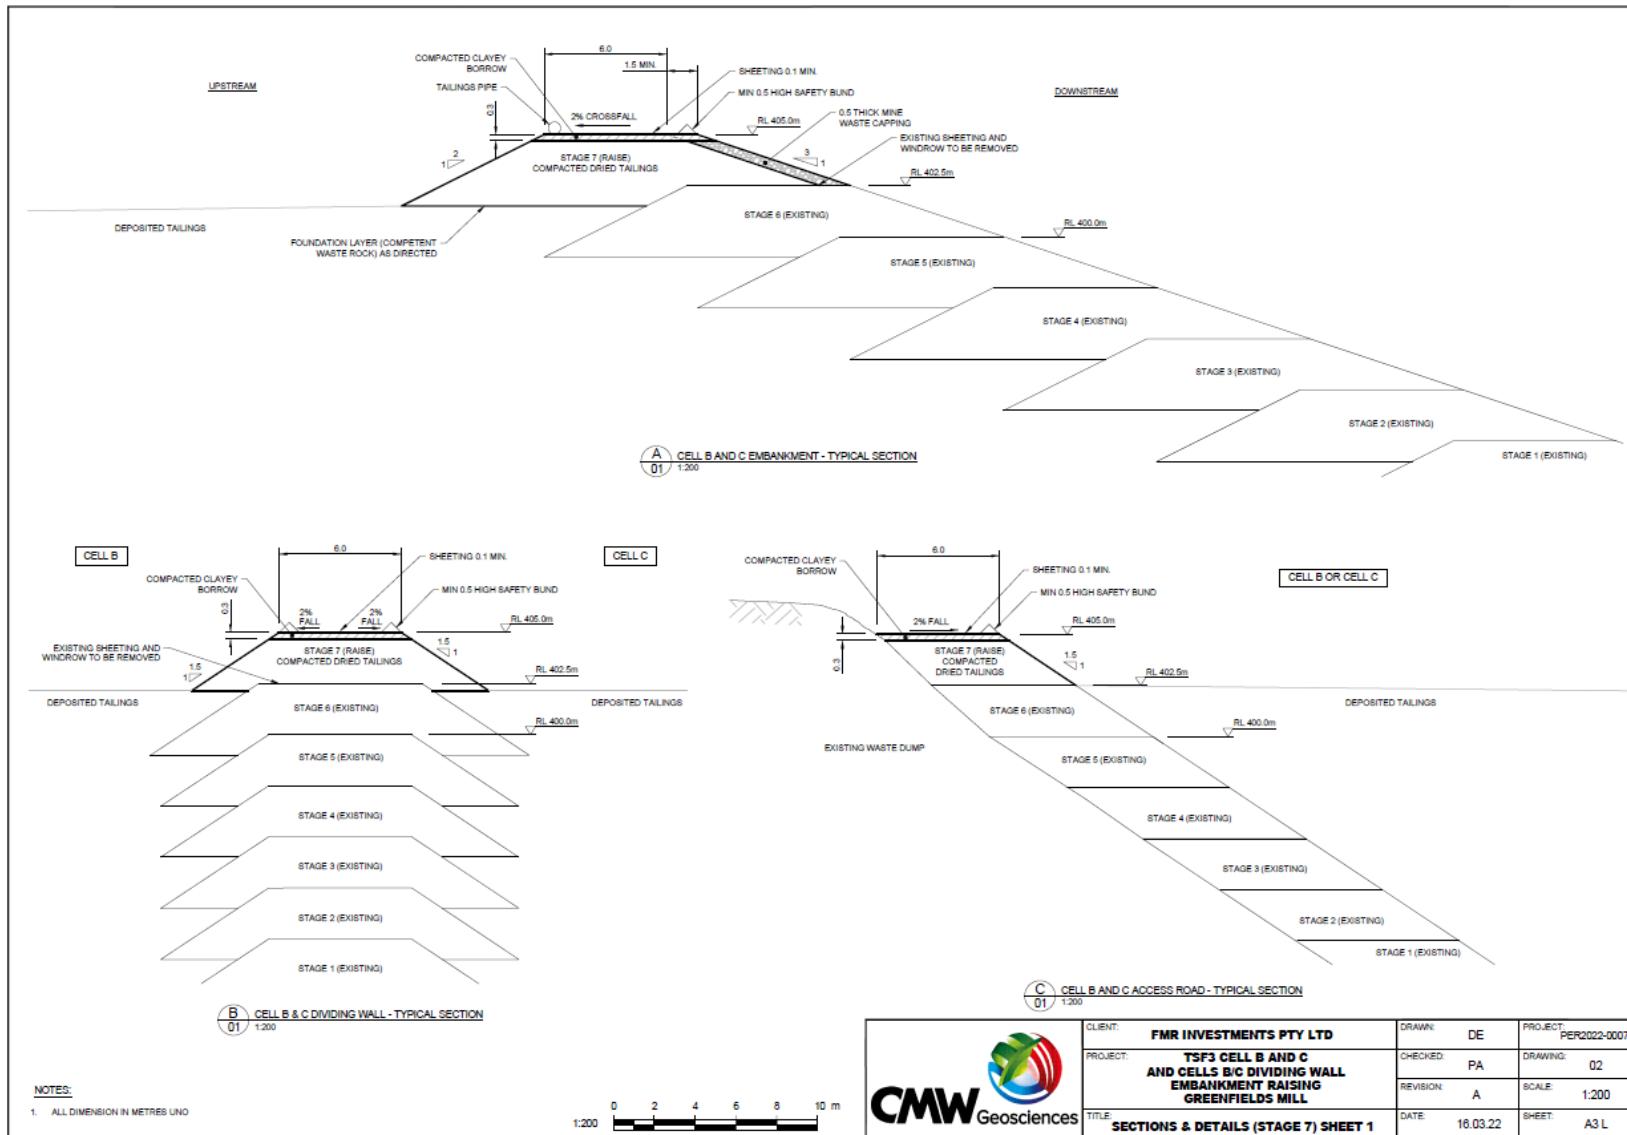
Cell B and C Stage 7 upstream perimeter embankment raise and dividing wall
